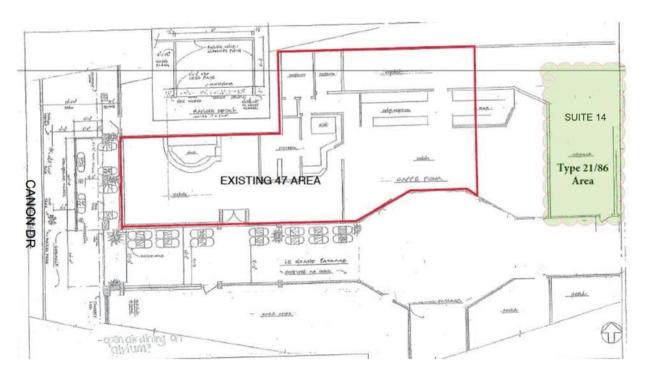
Caffe Roma / Liquor on Canon – First Floor Plan Source: Art Rodriguez Associates
